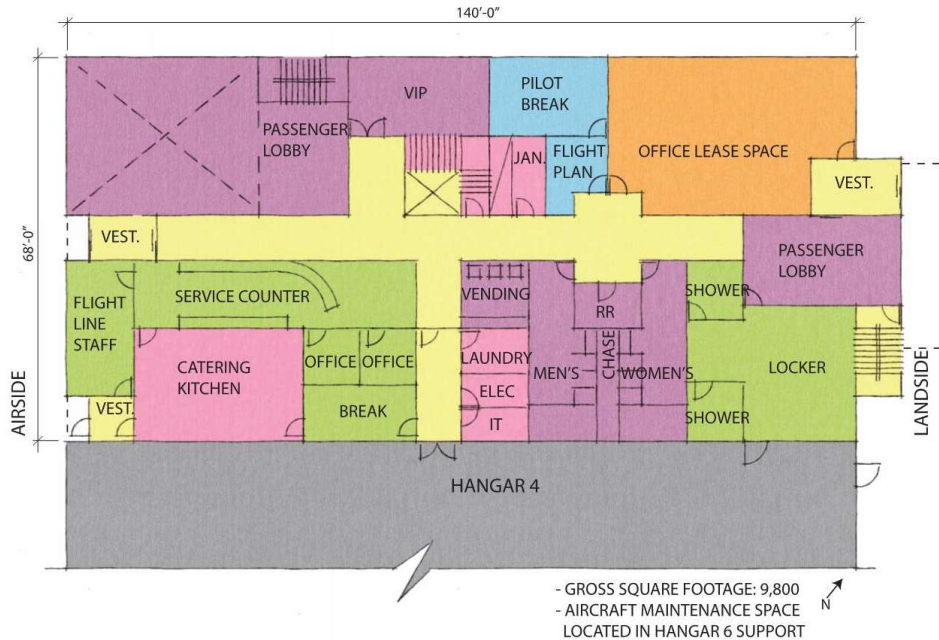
Preferred Concept – FBO Terminal First Floor Plan
